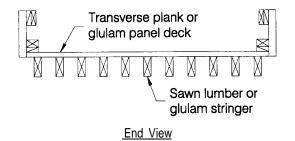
Typical configuration of a longitudinal stringer bridge.
